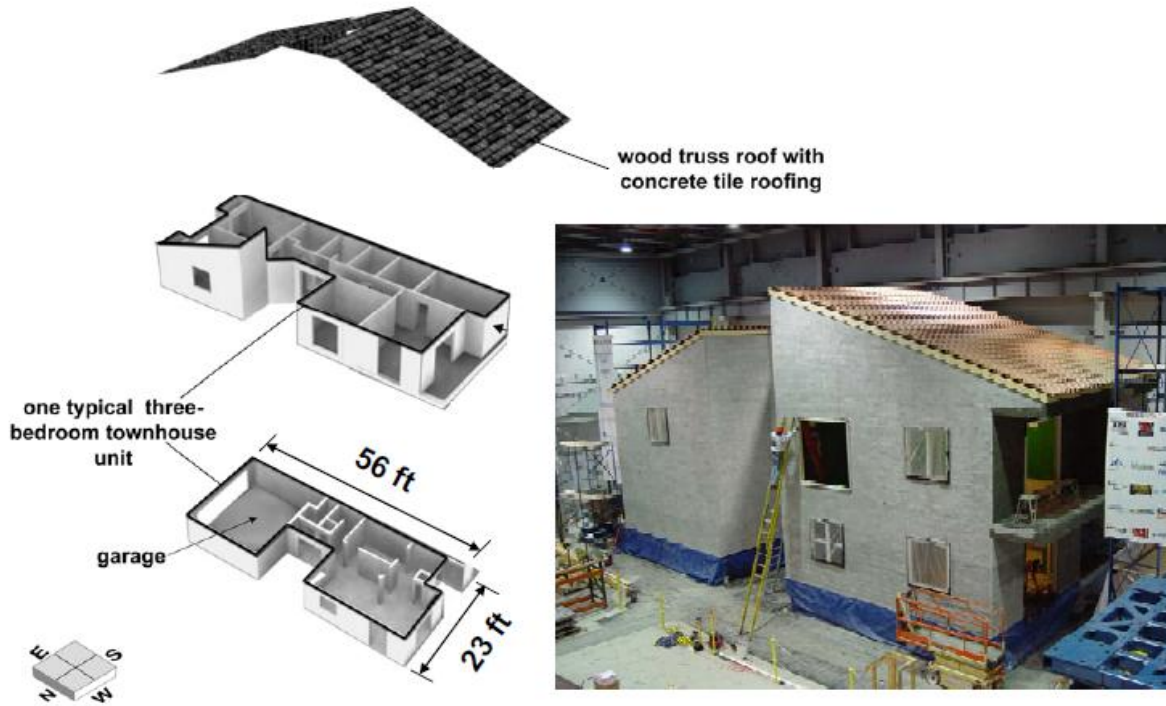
NEESWood Benchmark Test two story townhouse test structure [6]
